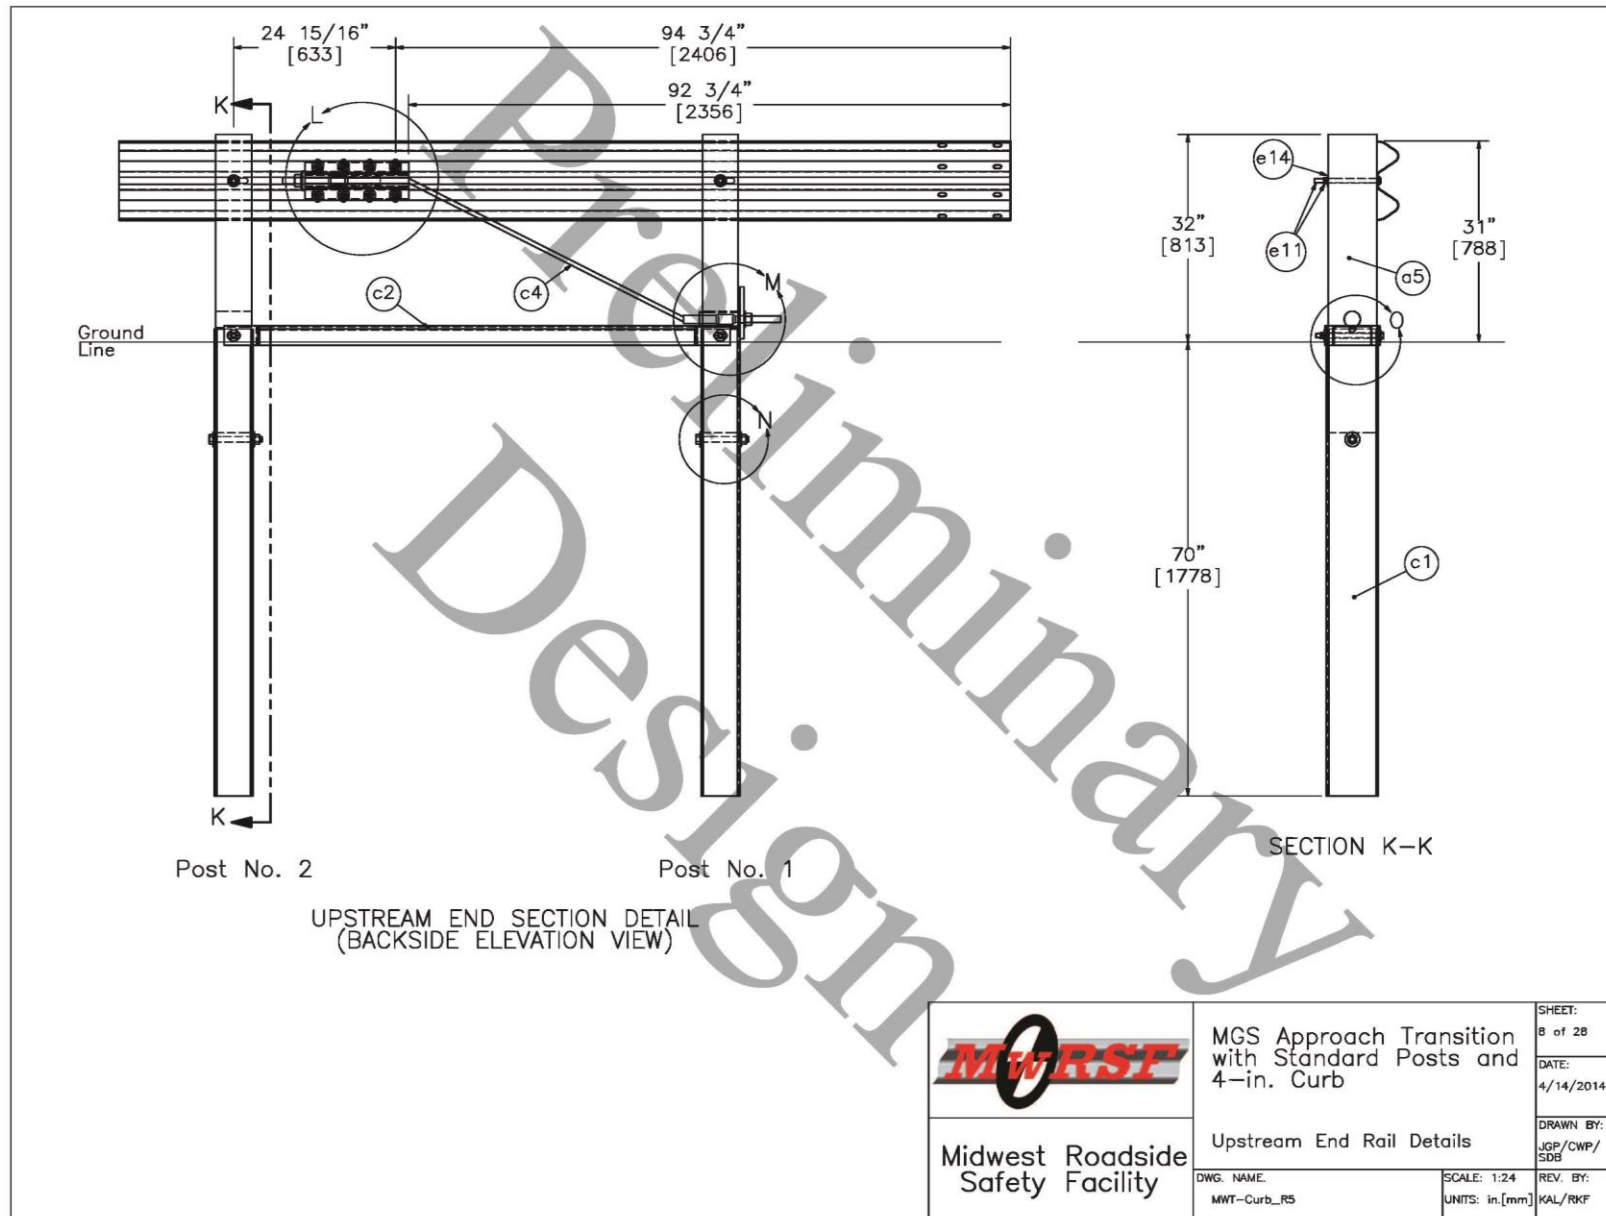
Upstream End Rail Details, Test No. MWTC-1
